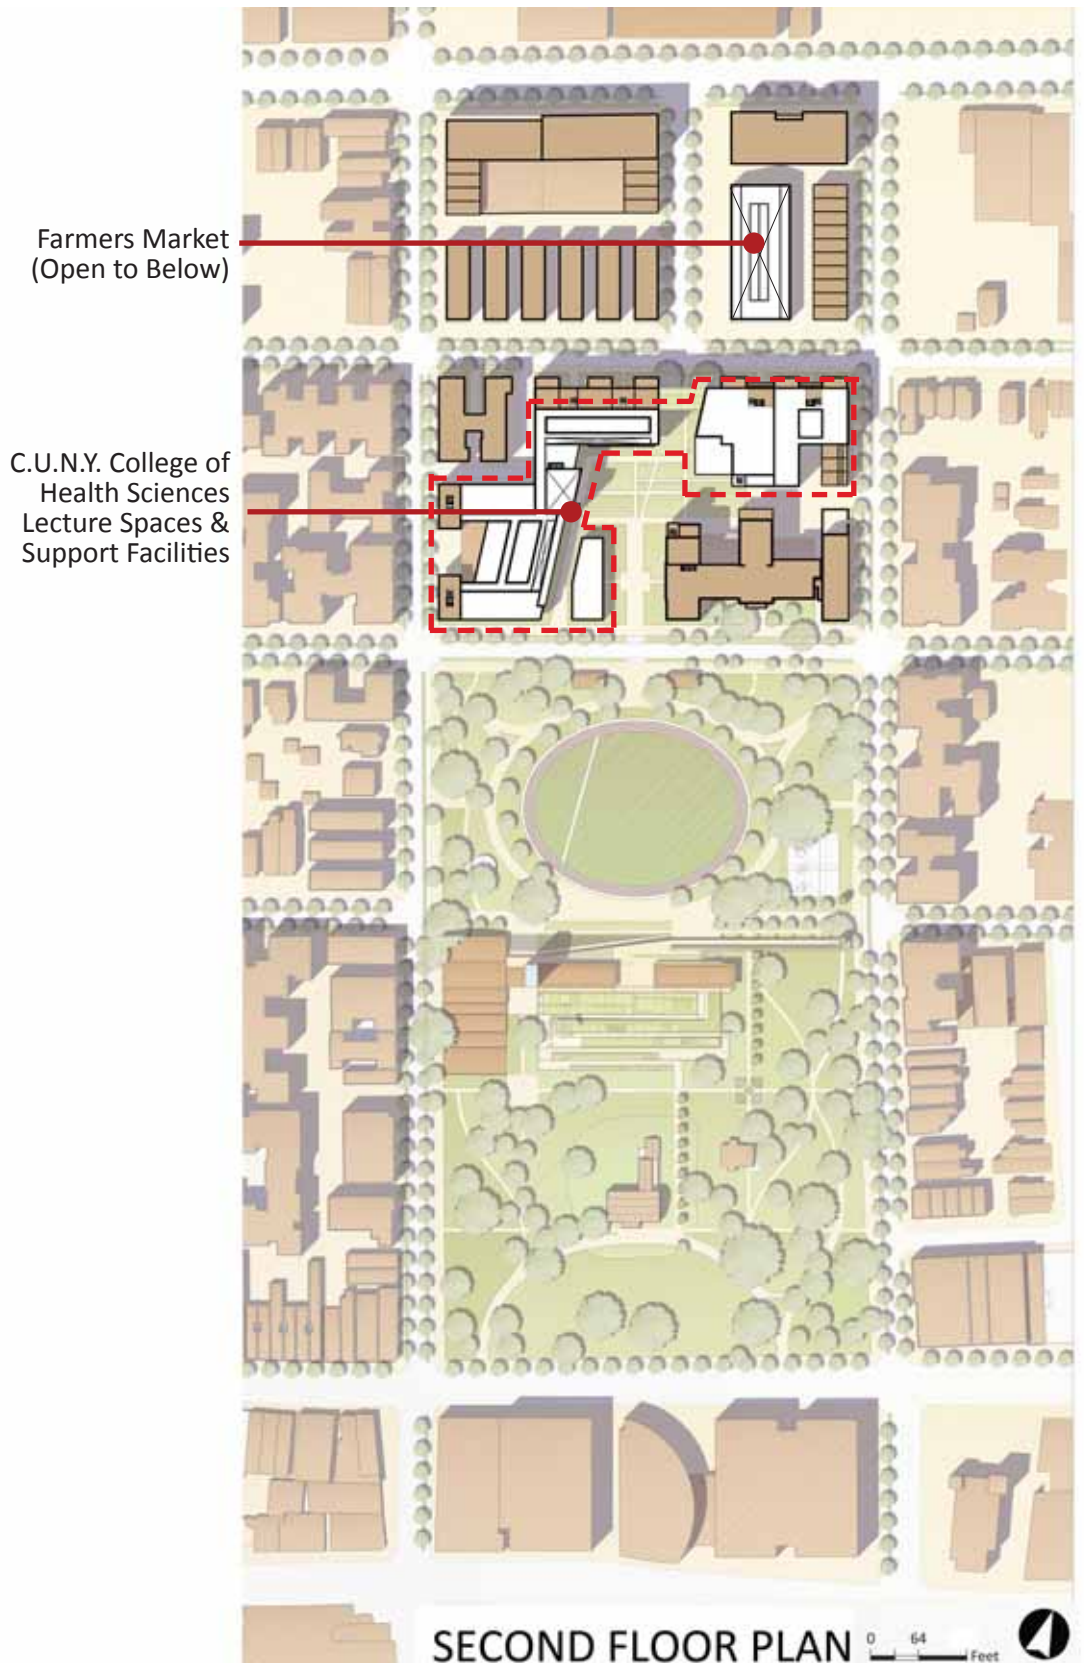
Second floor plan of urban design development showing location of City of New York College of Health Sciences' facilities located above the publicly accessible health clinics and amenities
